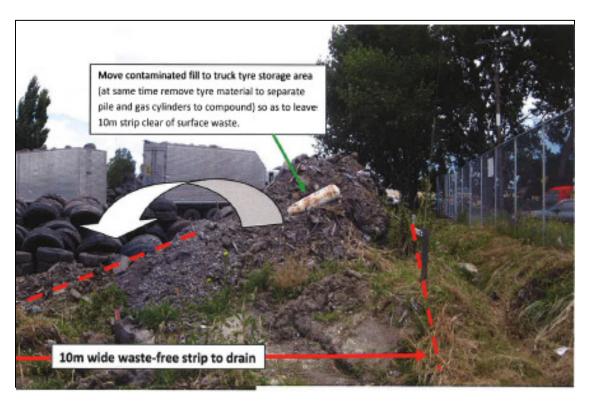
Contaminated spoil heap within 10m waste-free strip adjacent to drain
